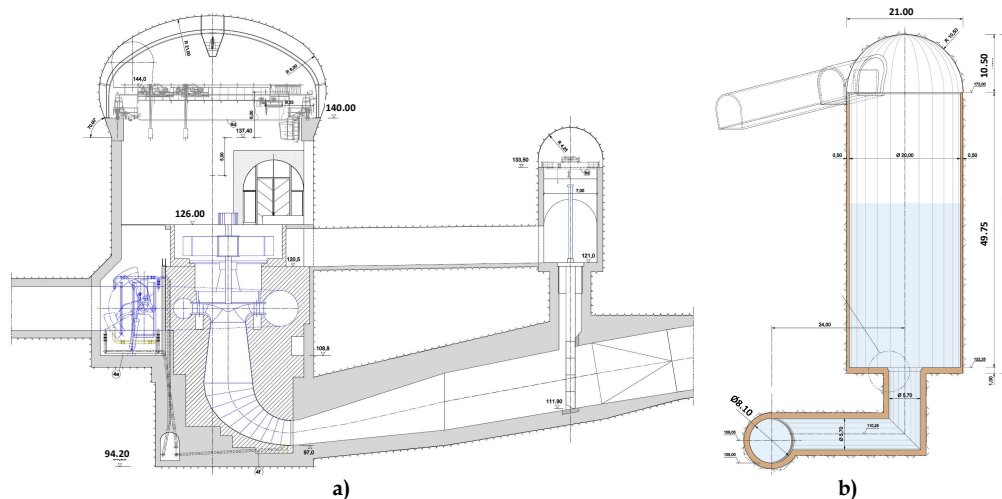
a) Power house main cross section; b) Surge tank cross section.
